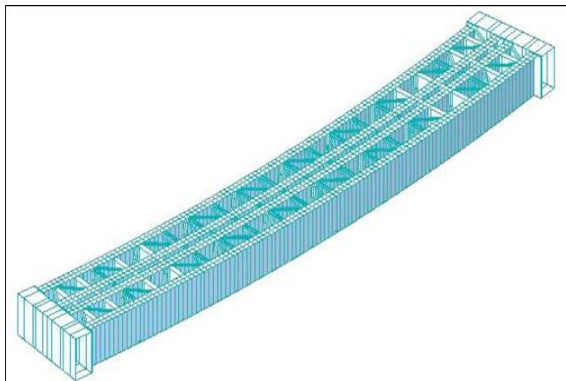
Stage 2 – Plan (Segments connected transversely and spliced longitudinally)
